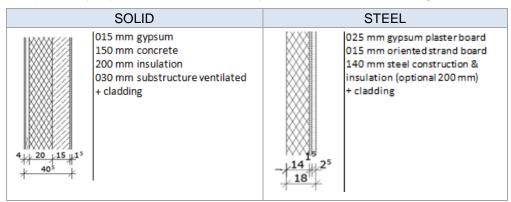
Construction details of opaque part of exterior wall of SOLID and STEEL
